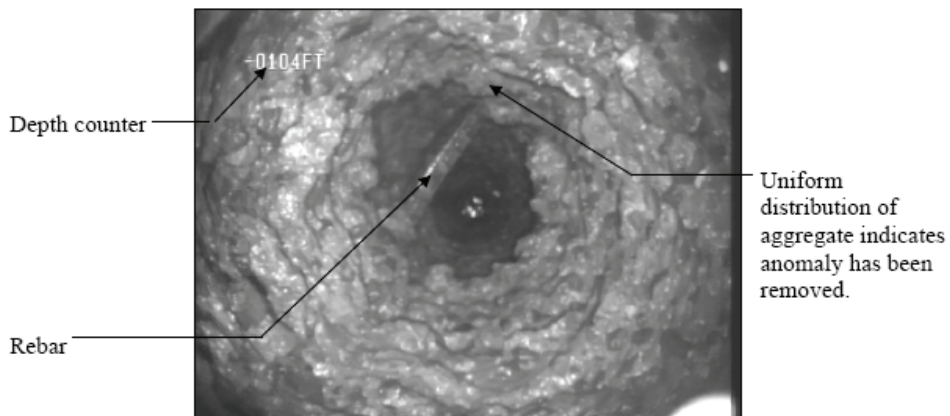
Downhole Camera View of Access Hole after Hydrodemolition (photo courtesy Ben C. Gerwick, Inc.)
